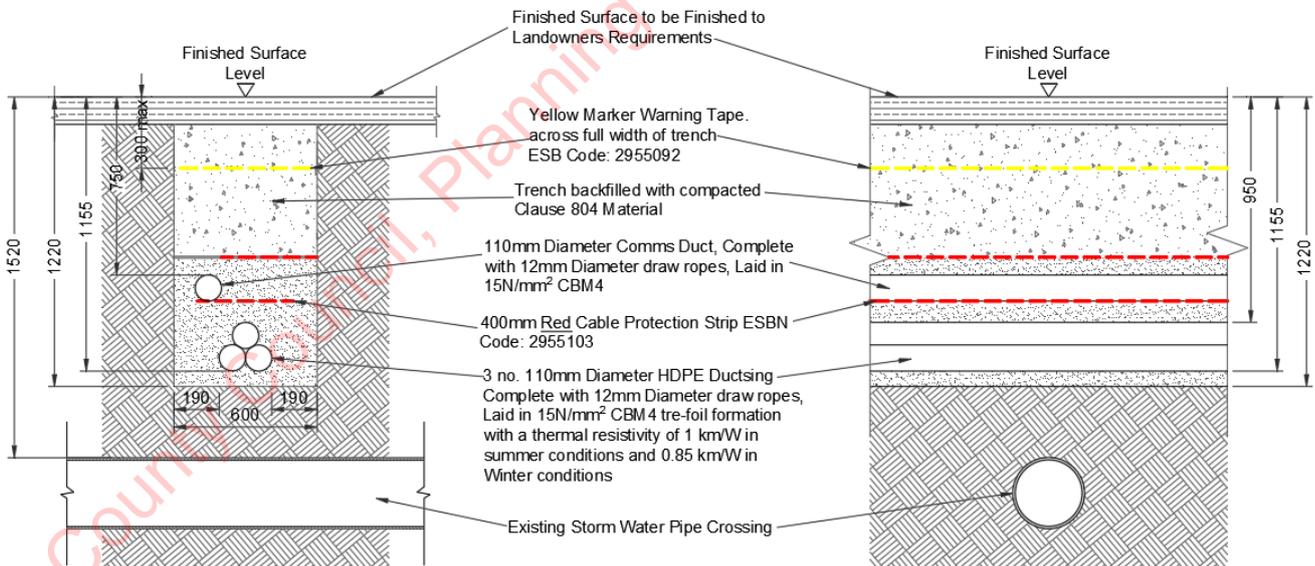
Piped Culvert Crossing – Ducting Over Culvert Crossing Details
